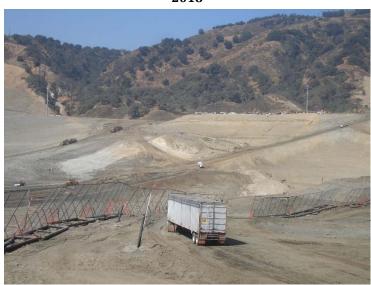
CC4 Part 3 & Buttress Excavation Area: September 12, 2018
